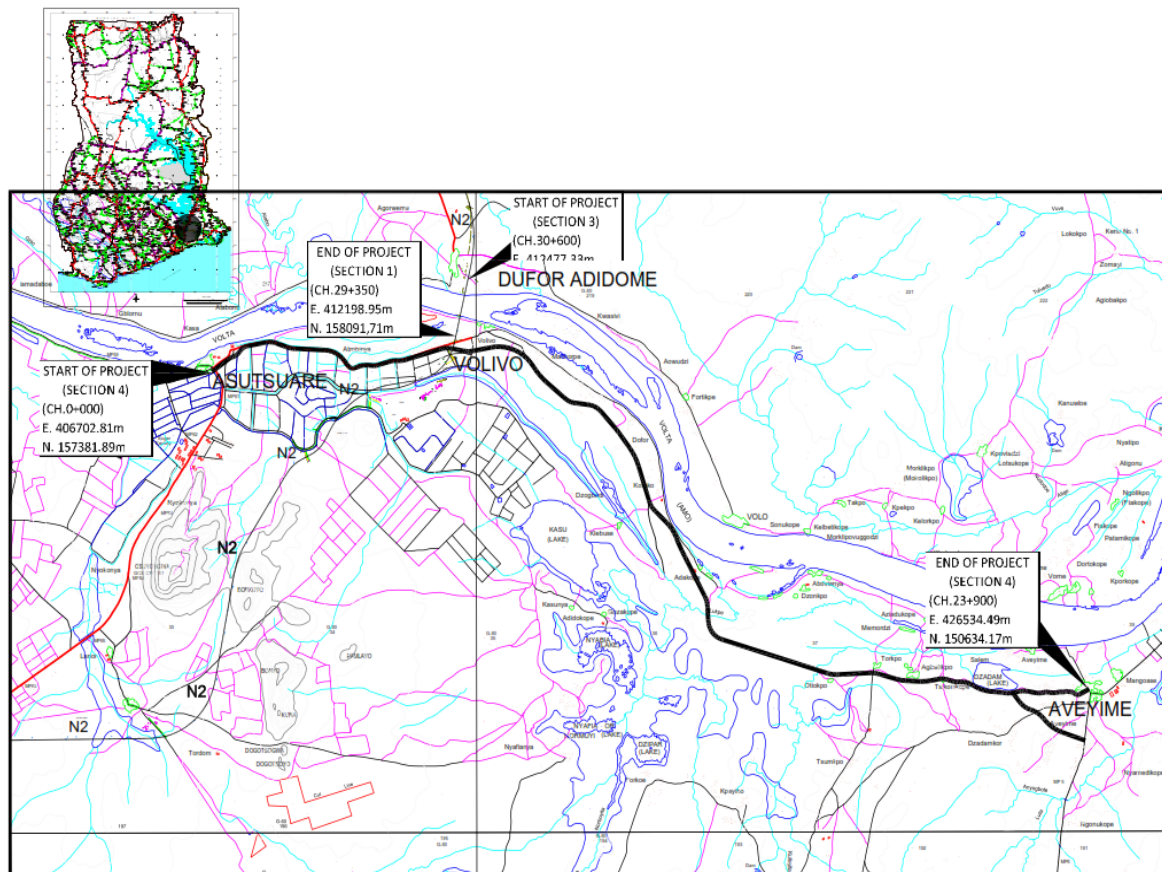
Asutware – Aveyime Road (Section 2 Project Road)
